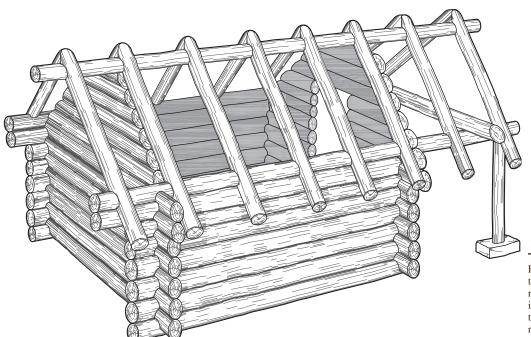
This drawing shows the structural framing of a rafter roof system. Rafter systems may include a ridge beam, shown in this drawing, or may use a simple ridge board that ties the rafters together at the peak of the roof. Keeping the Rain Out
